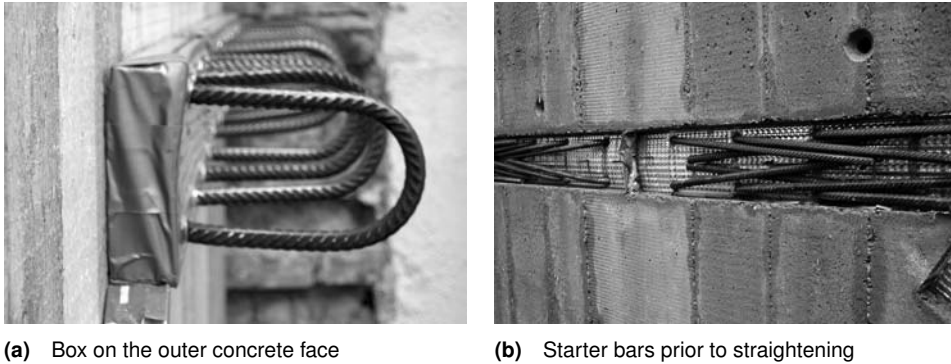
Cast-in starter bars, transition of a staircase-run to the adjacent concrete wall
